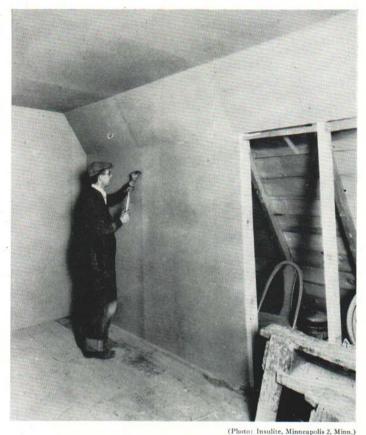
Four-foot sheets of rigid insulation applied to inside surface of wall studs and ceiling rafters.
